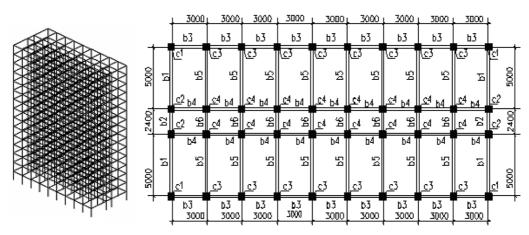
Vertical plan, standard layout and member group of 15-story RC frame
